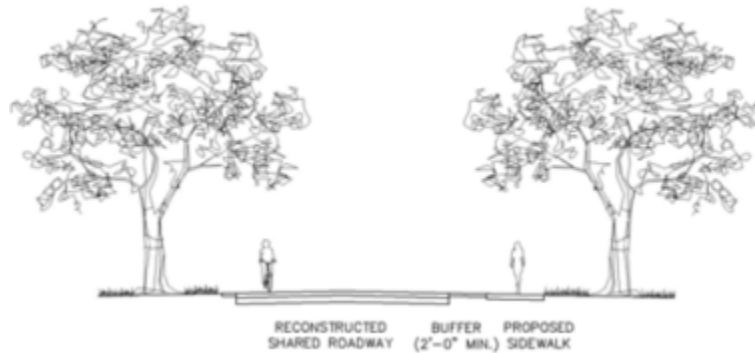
TYPICAL RECONSTRUCTED EXISTING ROADWAY
